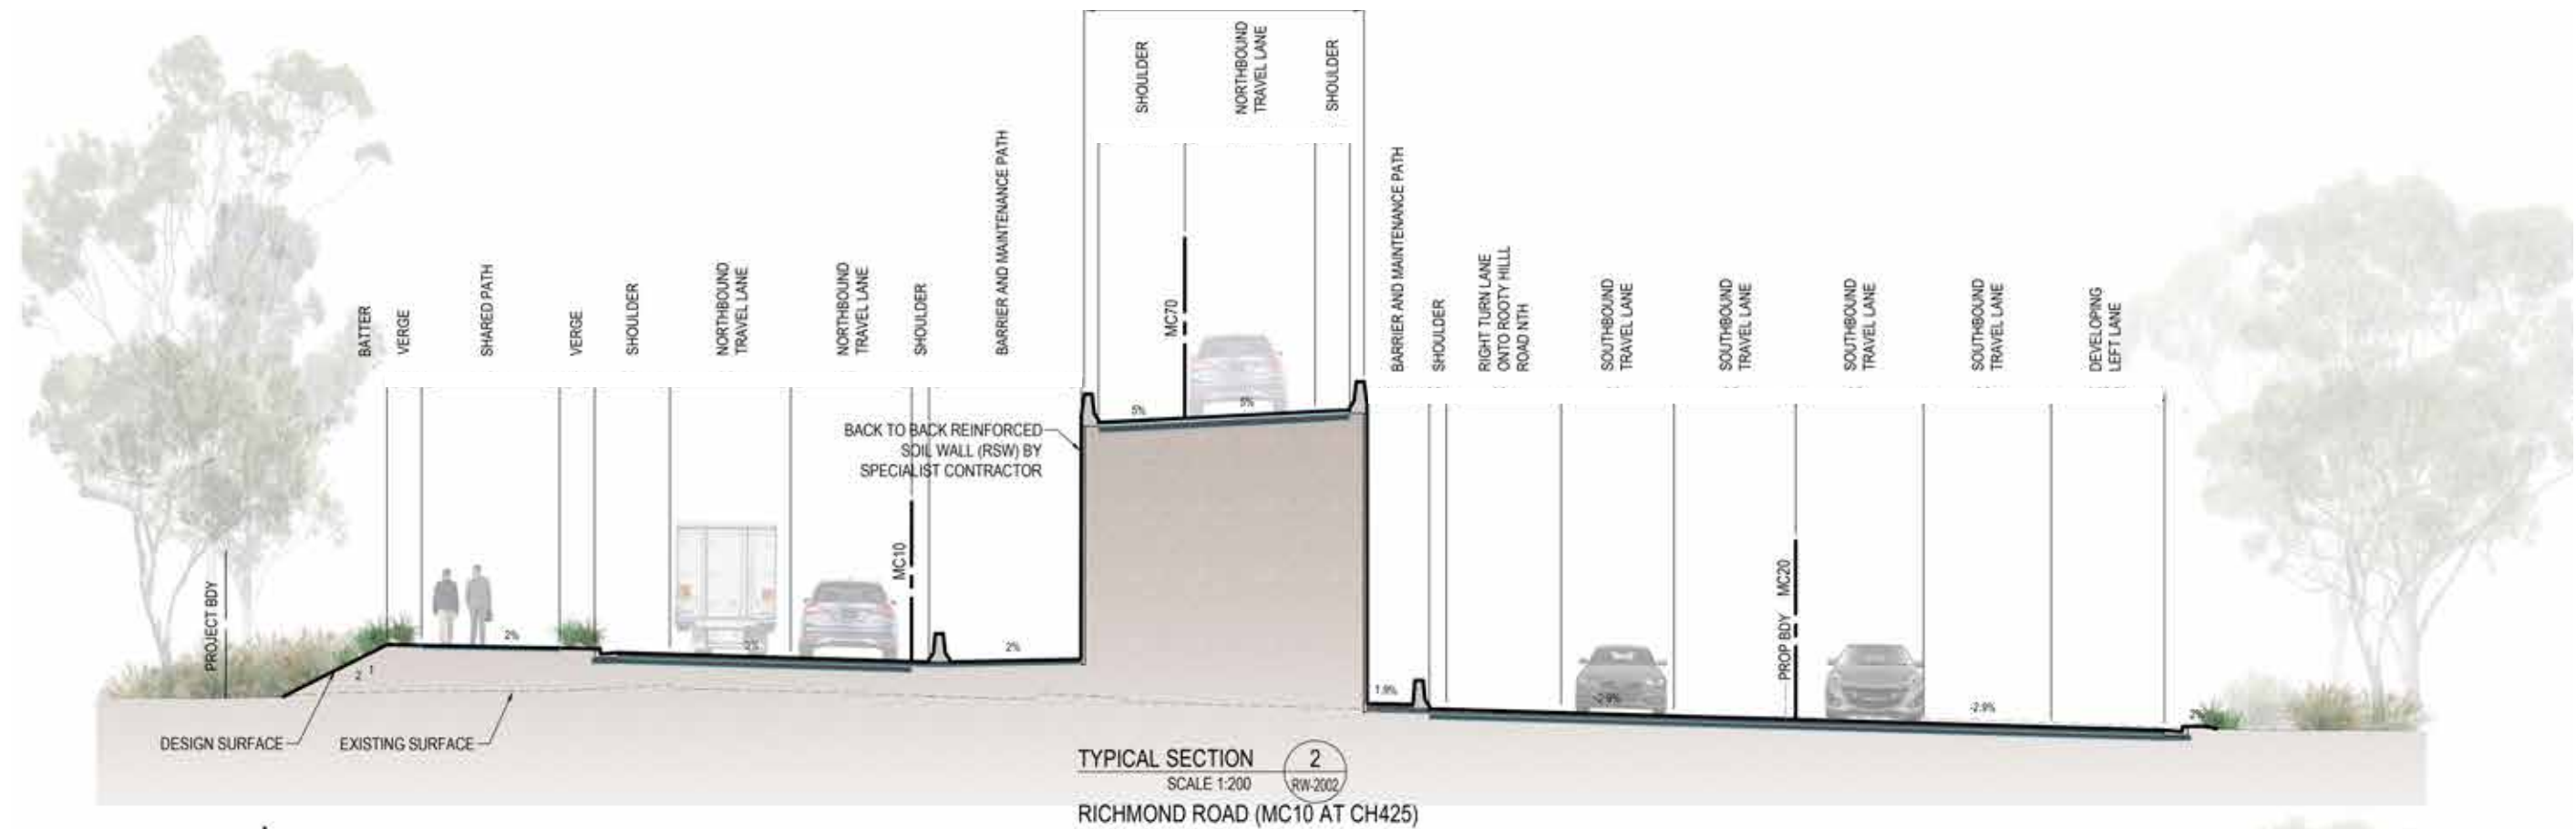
Cross section 2 through Richmond Road at CH425, looking north: where Bridge 1 (flyover) is descending to join northbound traffic on Richmond Road on vertical retaining walls
